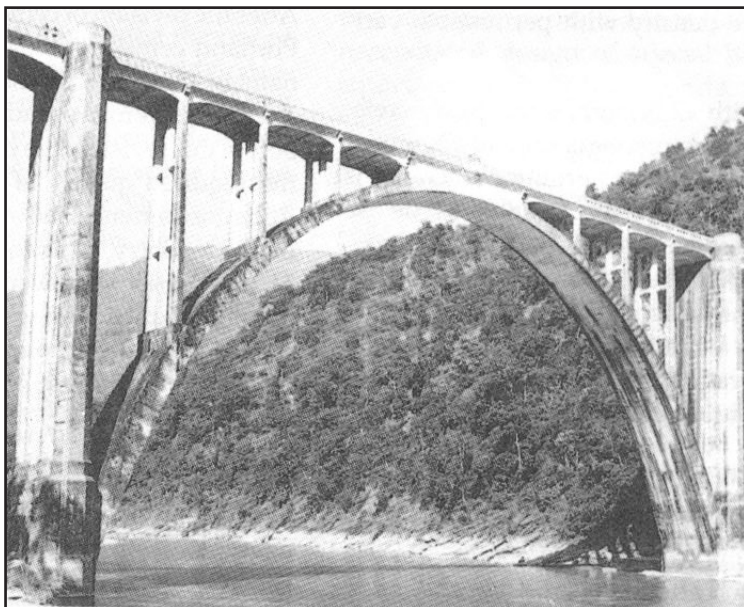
Coronation bridge over Teesta river in West Bengal -- an elegantly looking reinforced concrete open spandrel arch bridge.
